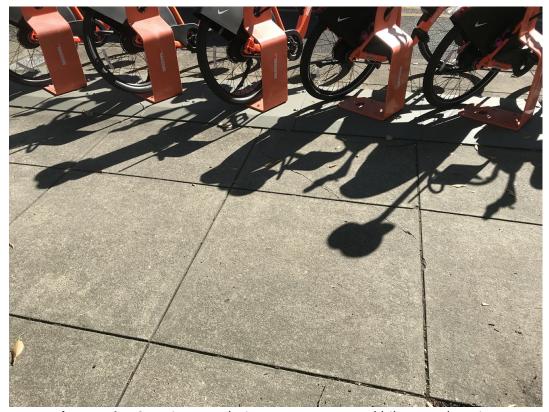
minor cracks in pavement around bike rental station
